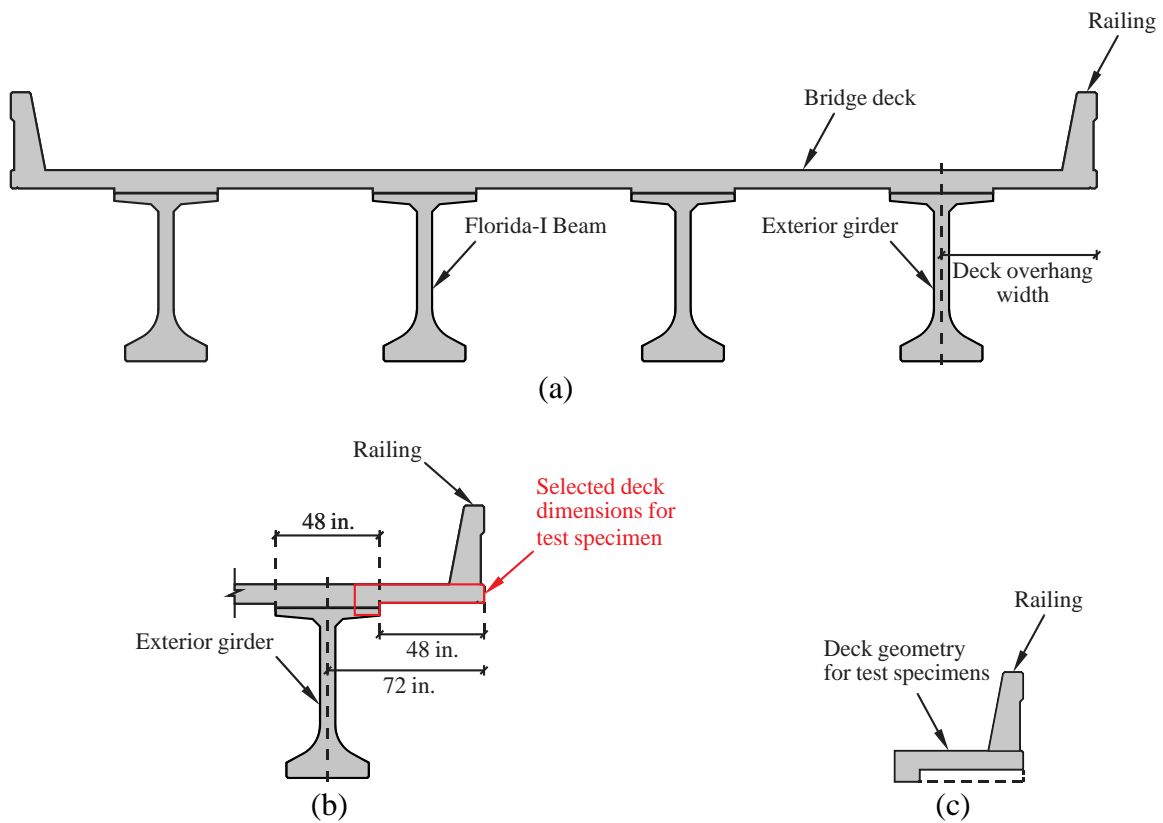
Approach for selecting cross-sectional deck dimensions: (a) Typical bridge cross-section; (b) Exterior girder and railing; (c) Selected geometry for test specimen
